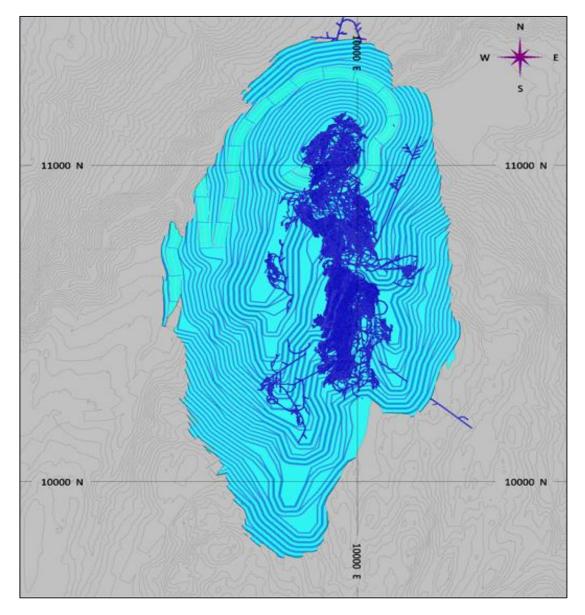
North Ultimate Pit and Existing Underground Workings
